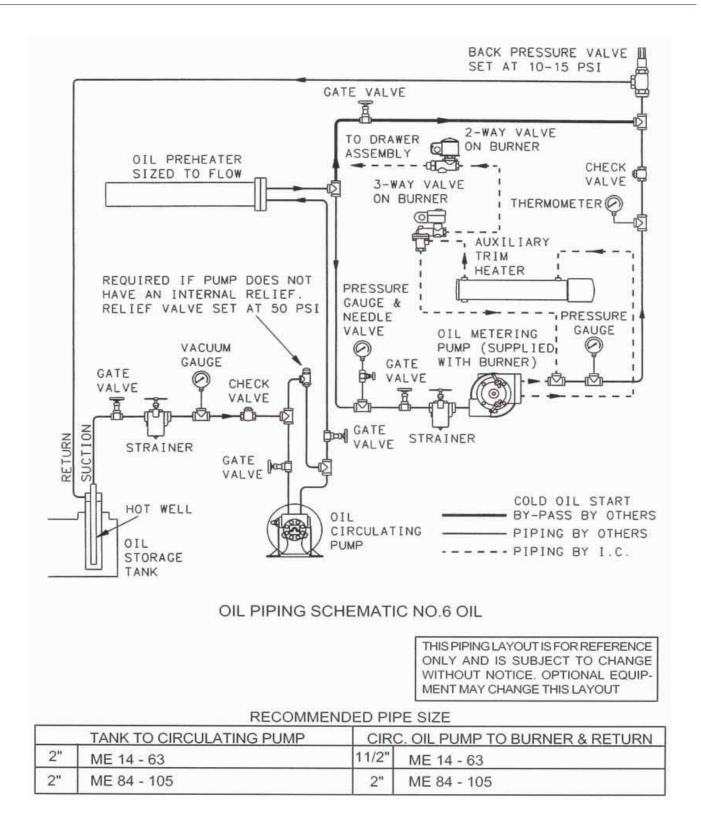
Oil Piping Schematic No. 6 Oil
